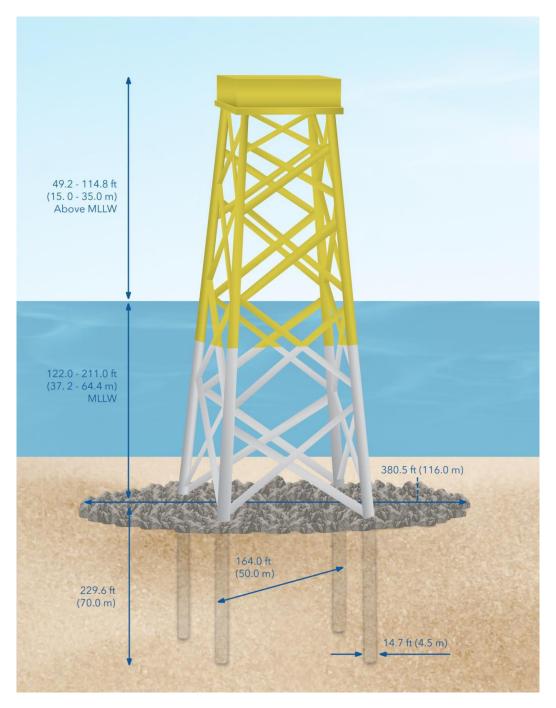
Indicative WTG piled jacket foundation diagram
